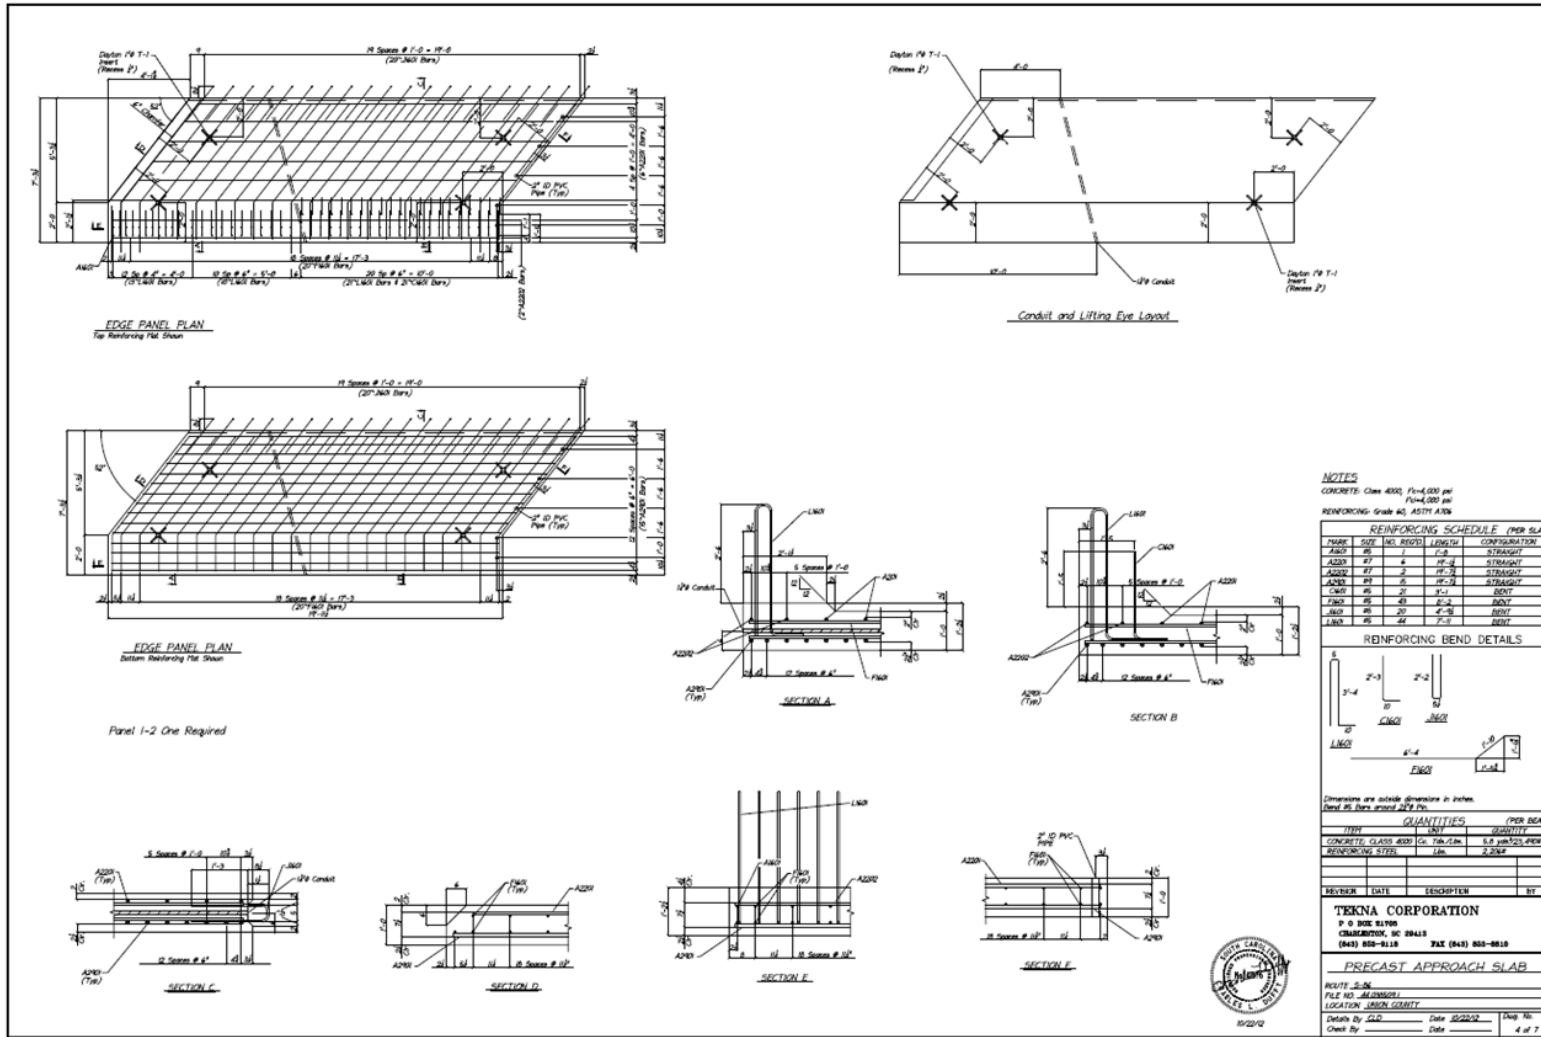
Bent One approach slab 'A' reinforcement schematic
